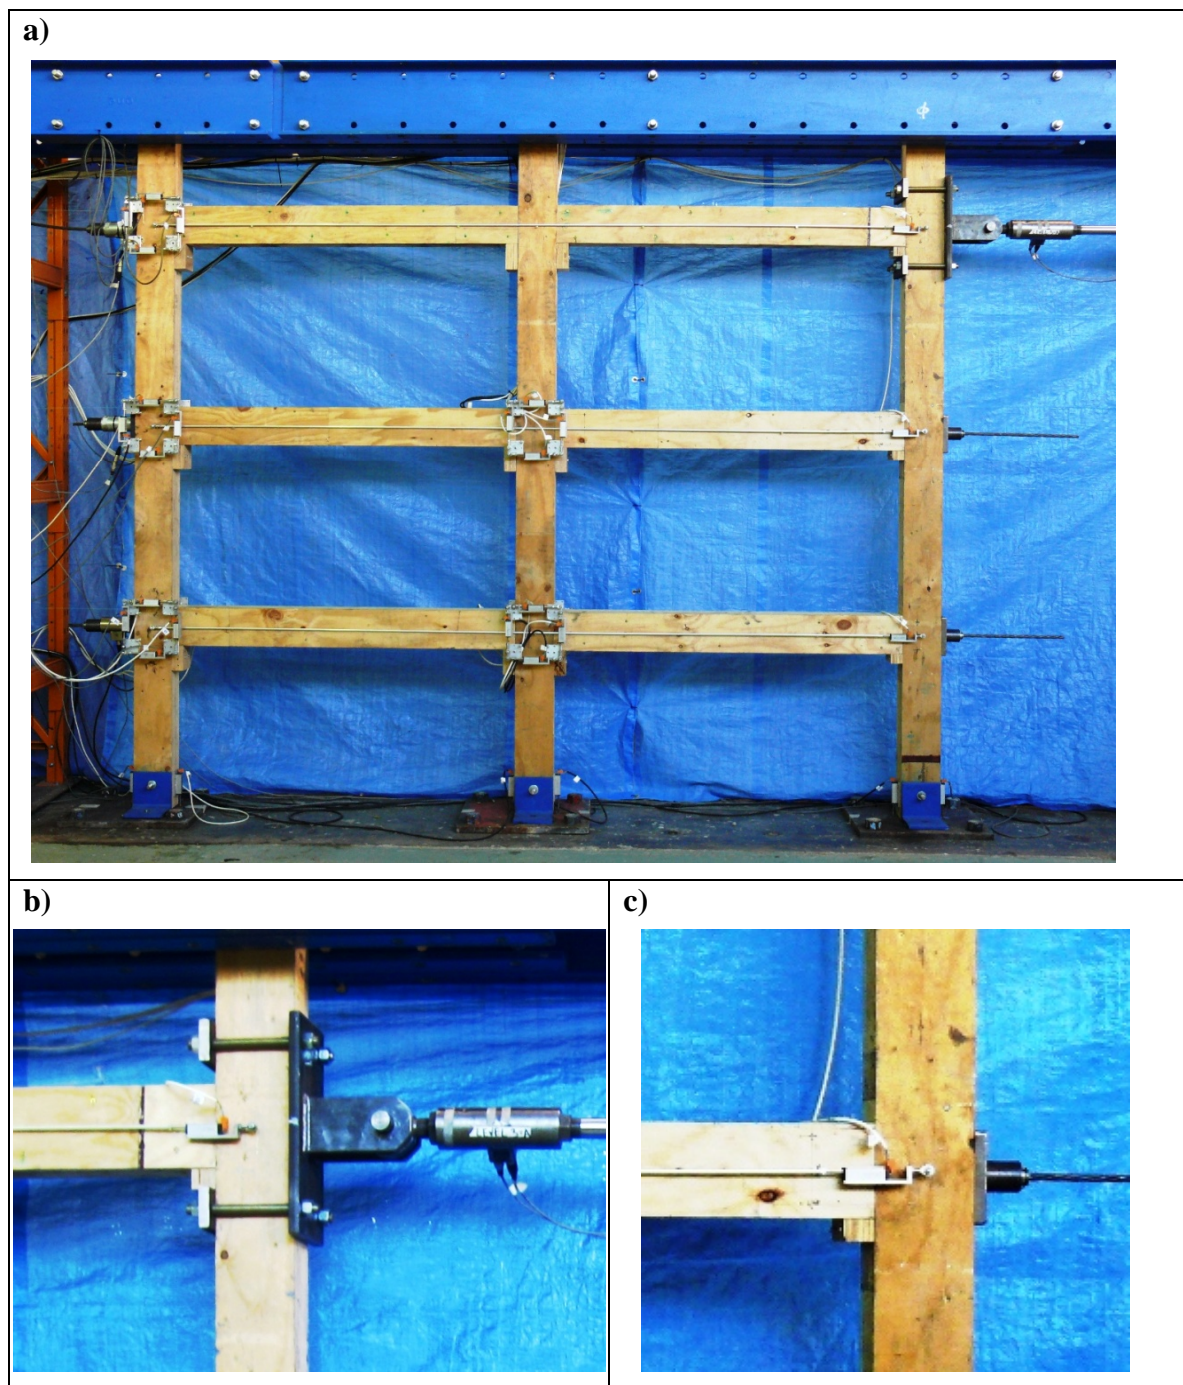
Quasi-Static test: a) 3-storey frame b) Hydraulic ram connection to frame c) Typical beam-column connection
